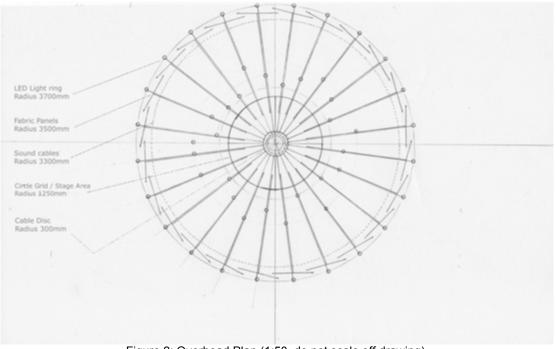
; Overhead Plan (1:50, do not scale off drawing)
